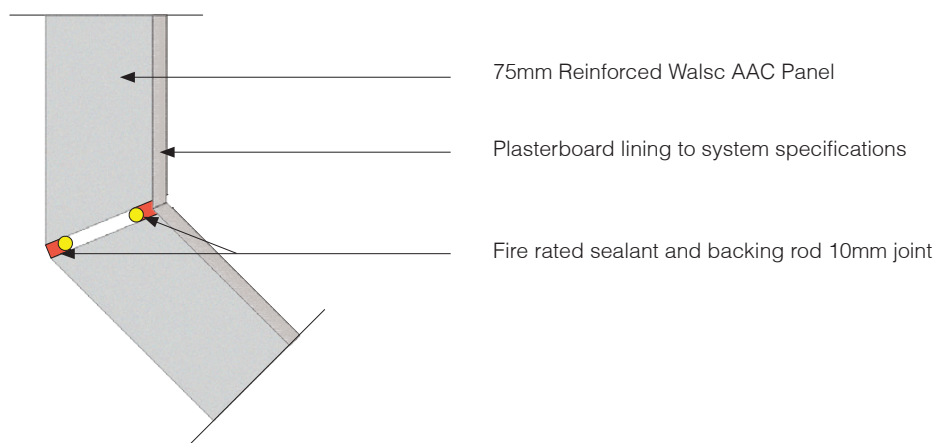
Service Shaft Wall Option 1 Mitred Control Joint Detail
